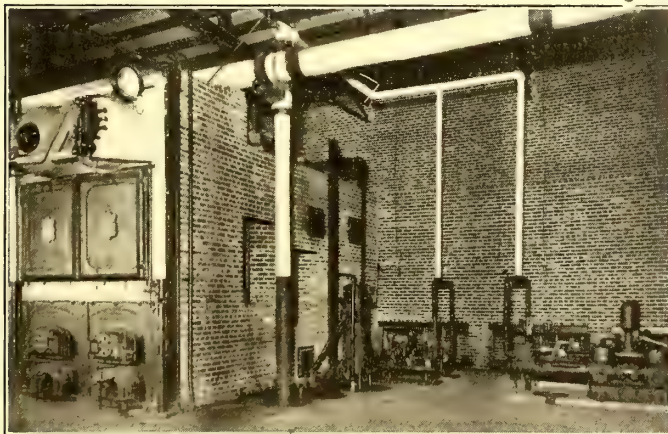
FUEL OIL PUMPS AND FEEDER PUMPS IN BOILER ROOM
